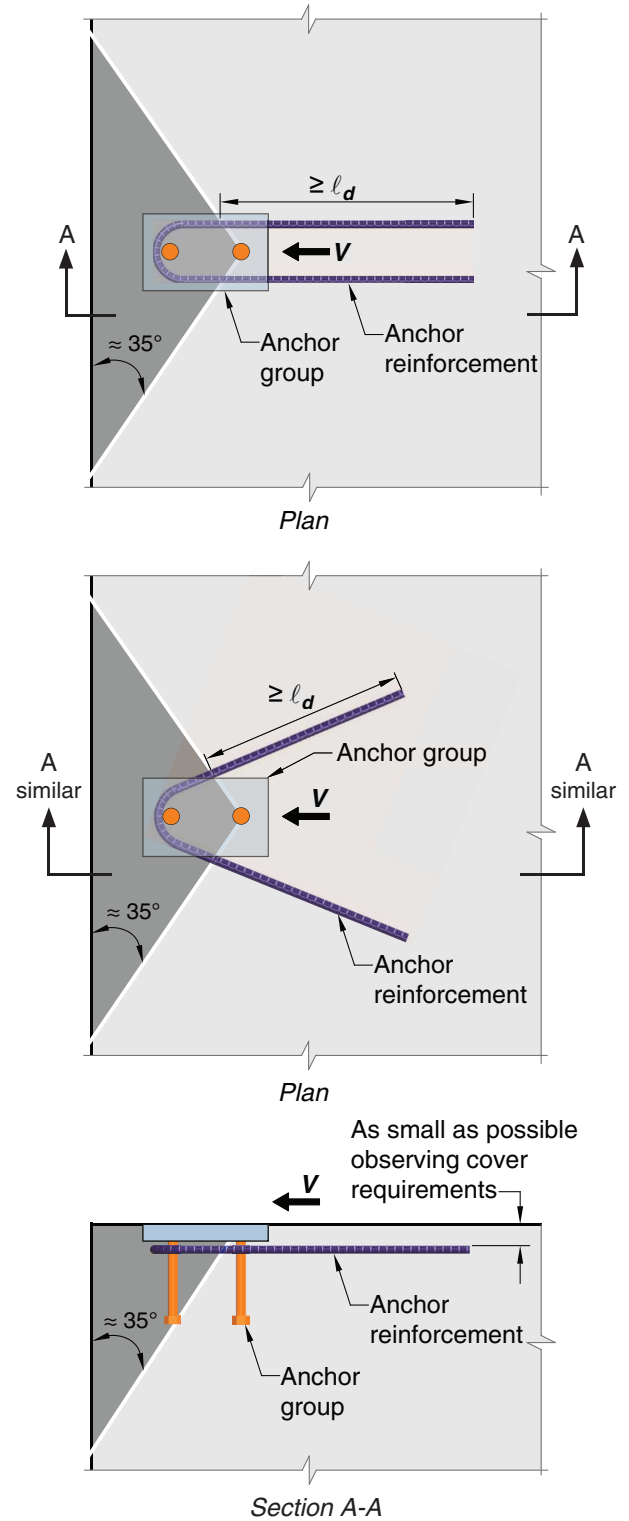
(i)—Hairpin anchor reinforcement for shear.
